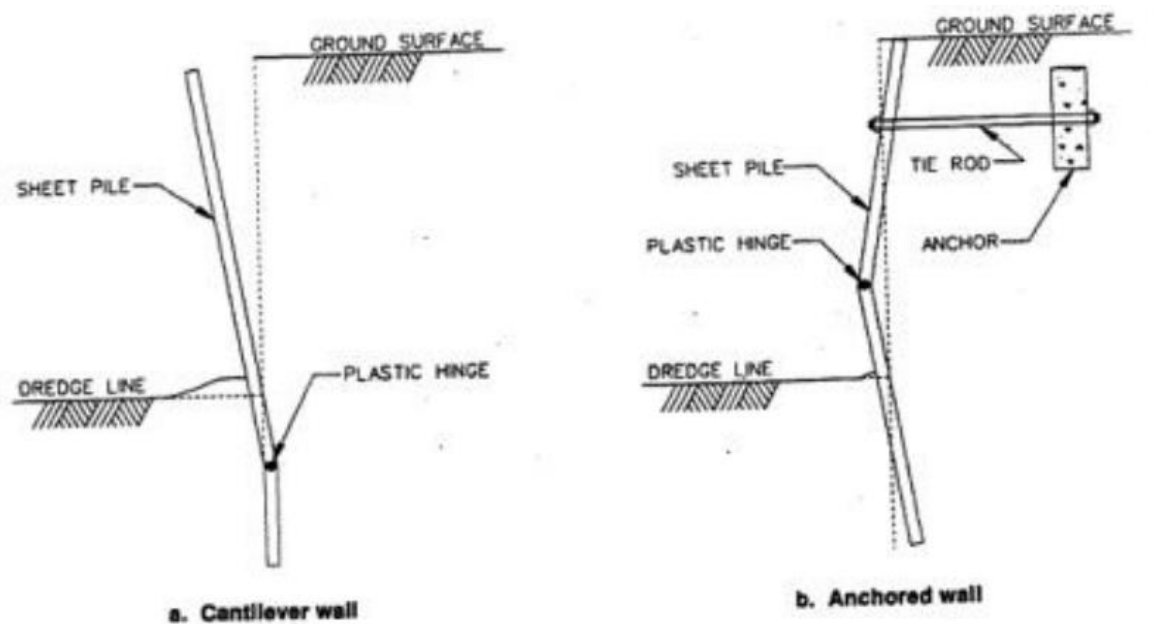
flexural failure in both cantilever and anchored sheet piles [29].
